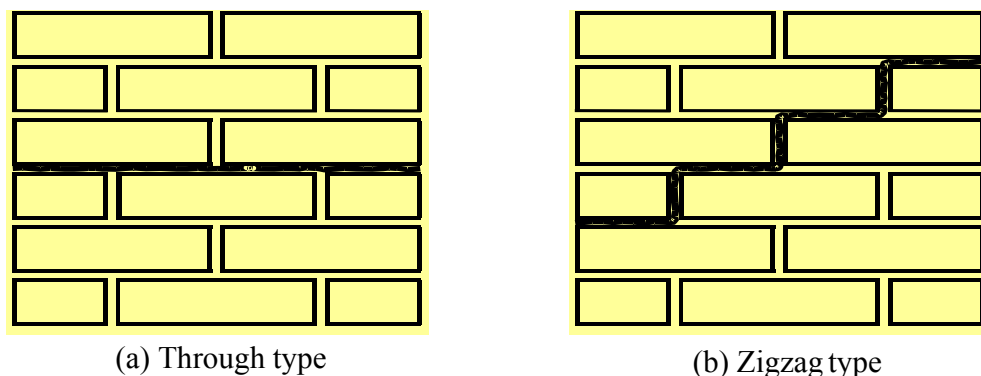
Modes of tension failure of masonry walls under direct tension (Backes, 1985)
